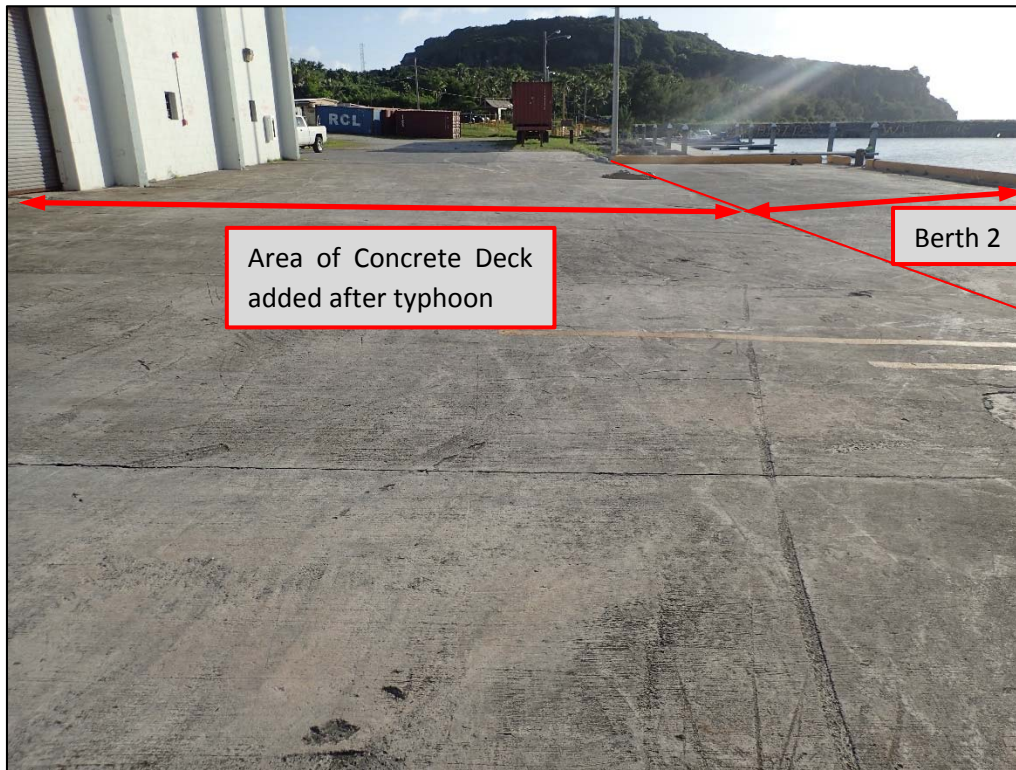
Berth 2. Section between Berth 2 and the building which was added after the subsoil was washed out by a typhoon.
